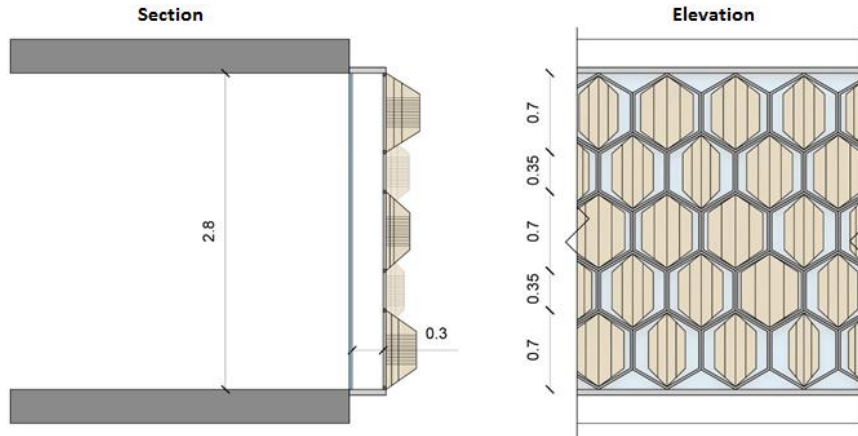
Details of proposed shape morphing skin installation in front of the building glass façade.
